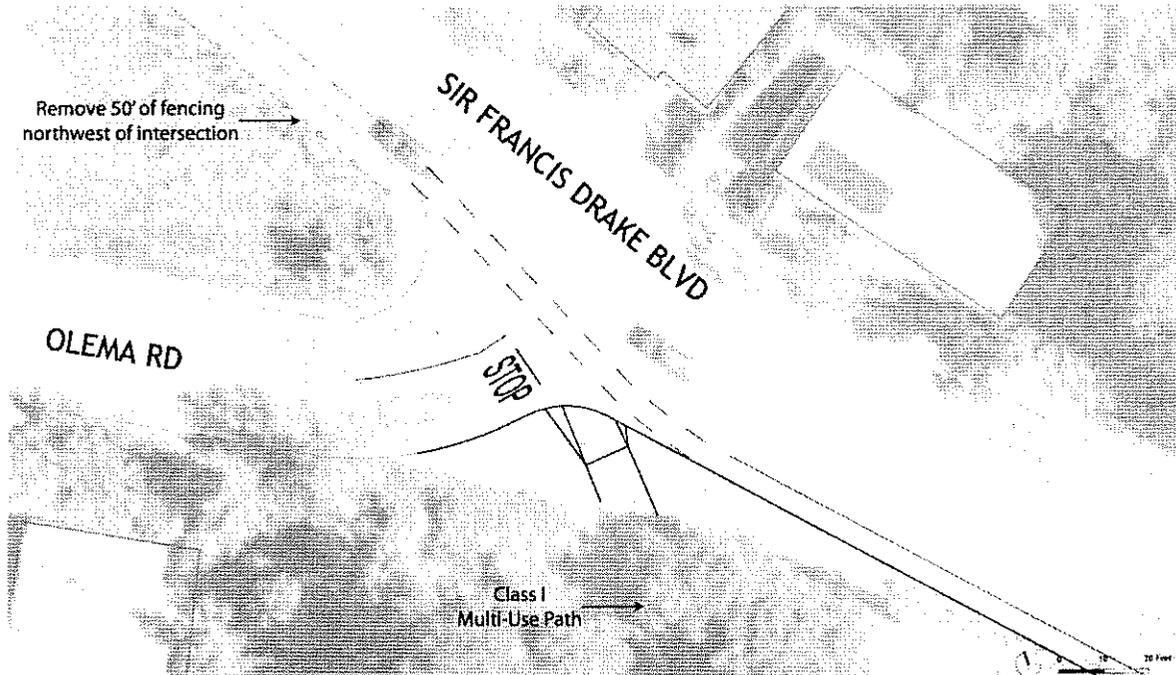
Plan View of Proposed Improvements for Project 3: SFD/Olema Road (east)
